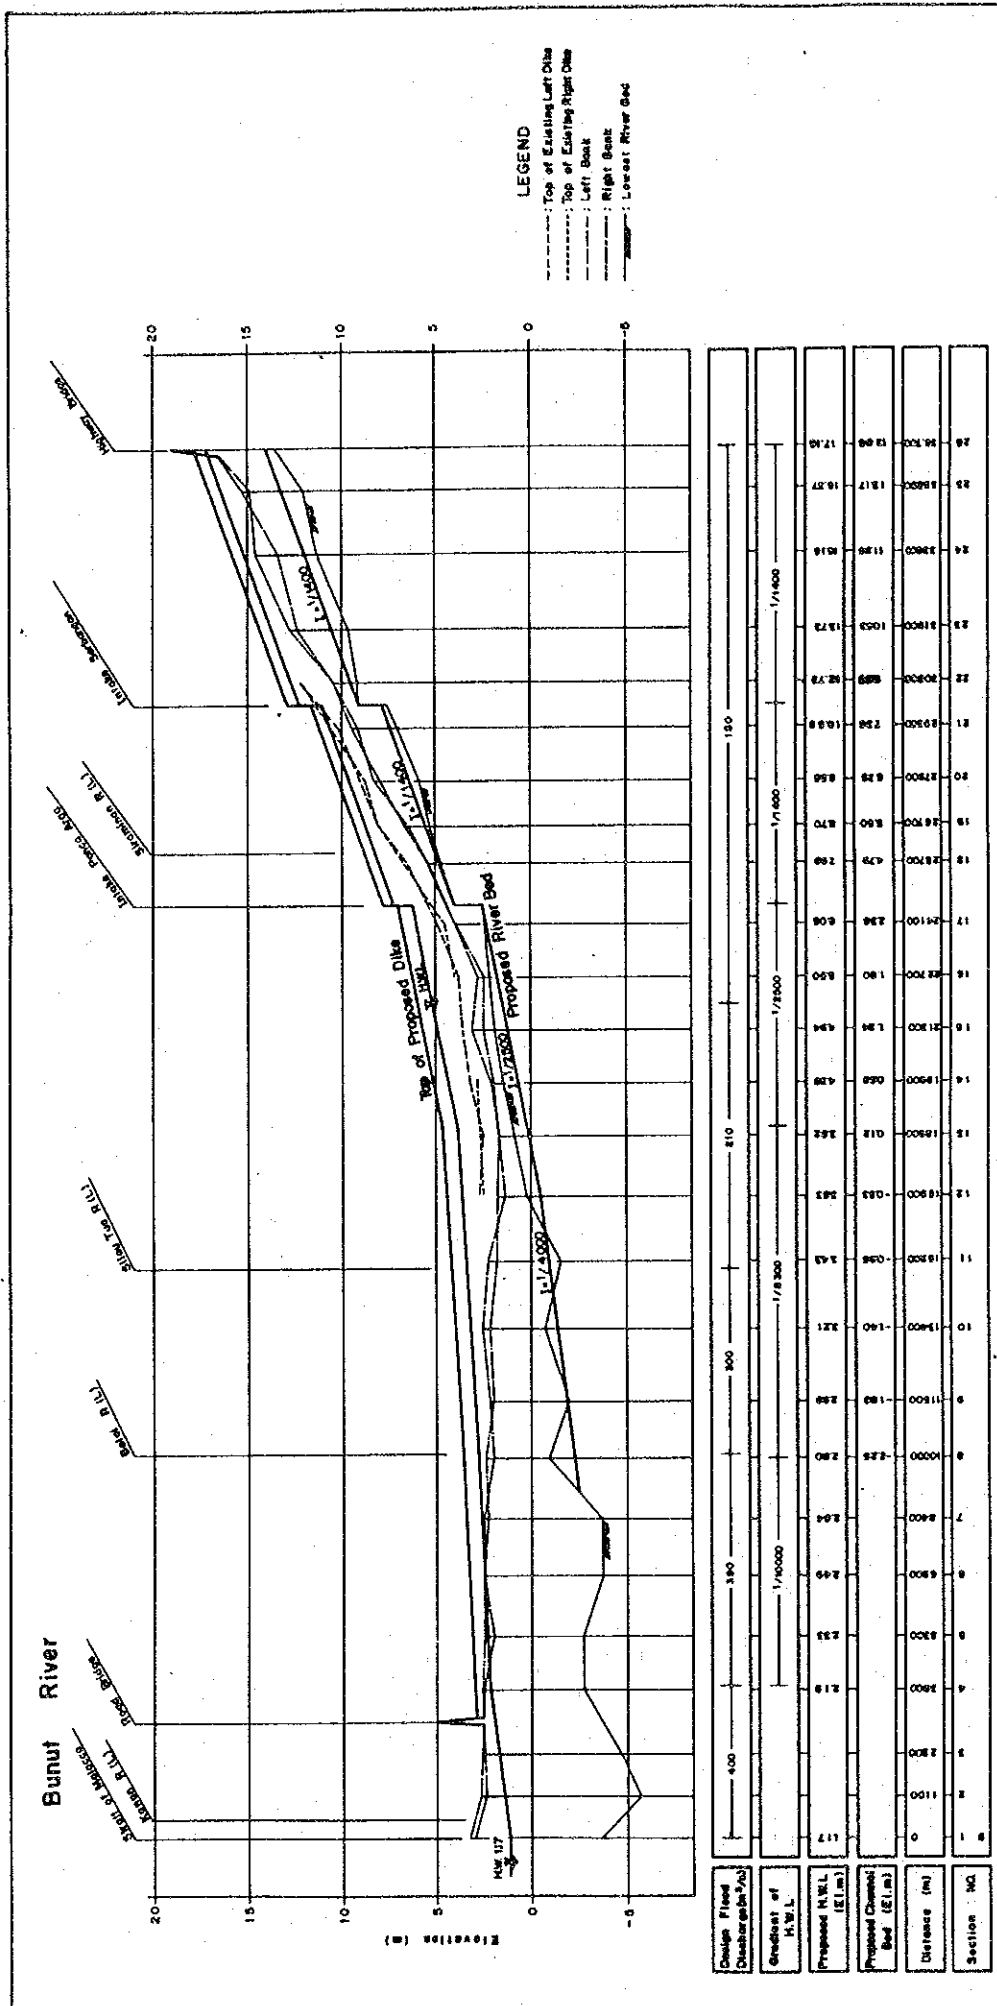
Proposed Long-Term Plan of Bunut River (3/3)
